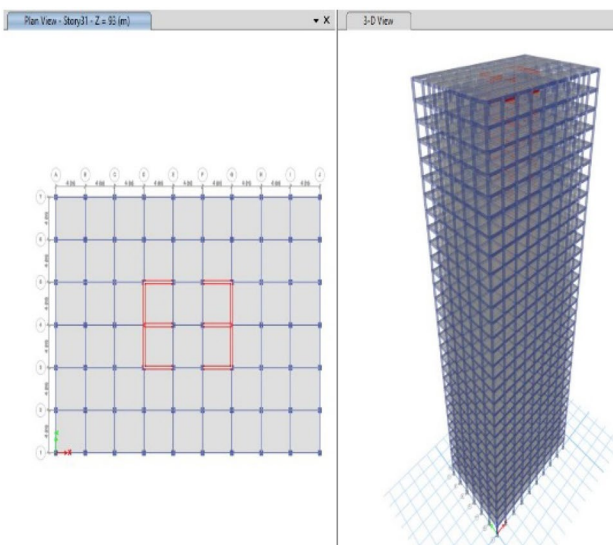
Model-8: Buildings with shear wall located at the centre in E-shape
